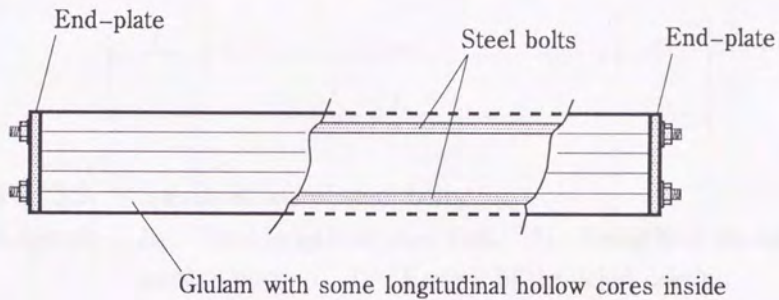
An example of glulam timber beam prestressed longitudinally by steel bolts (PSG-beam).
